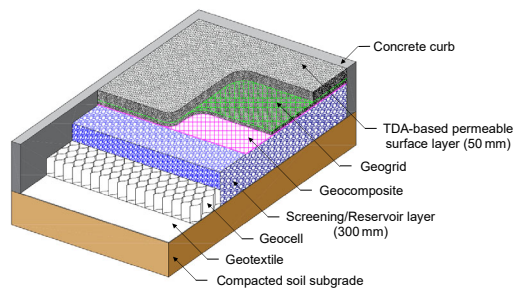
Typical cross-section of the pavement (Raeesi et al. 2020)
